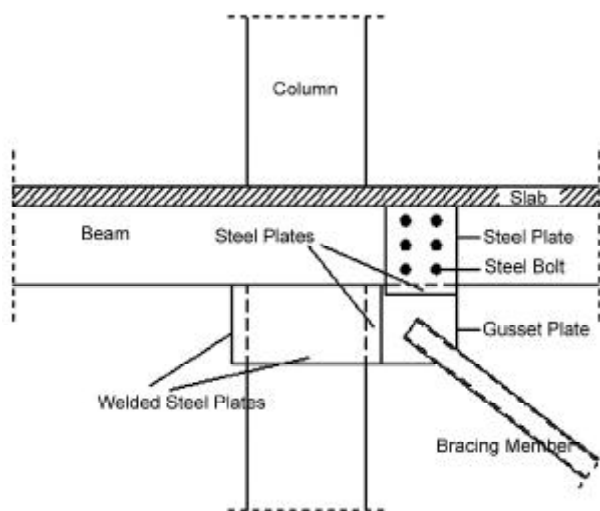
Connection detail of the bracing member to the existing concrete frame elements [13].
